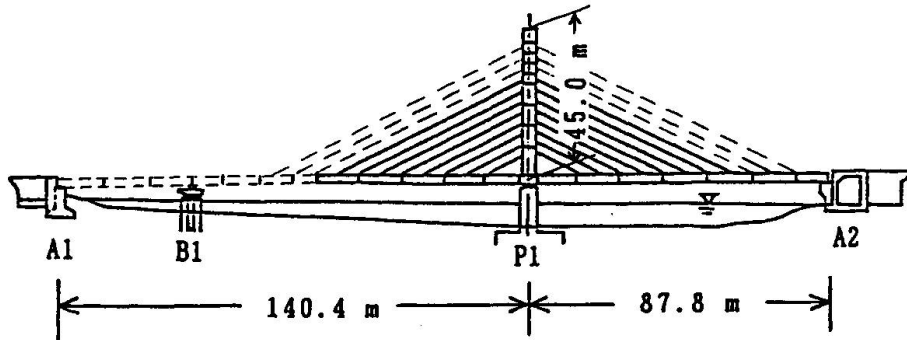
Erection of Bannaguro Bridge (13th and final stages)
